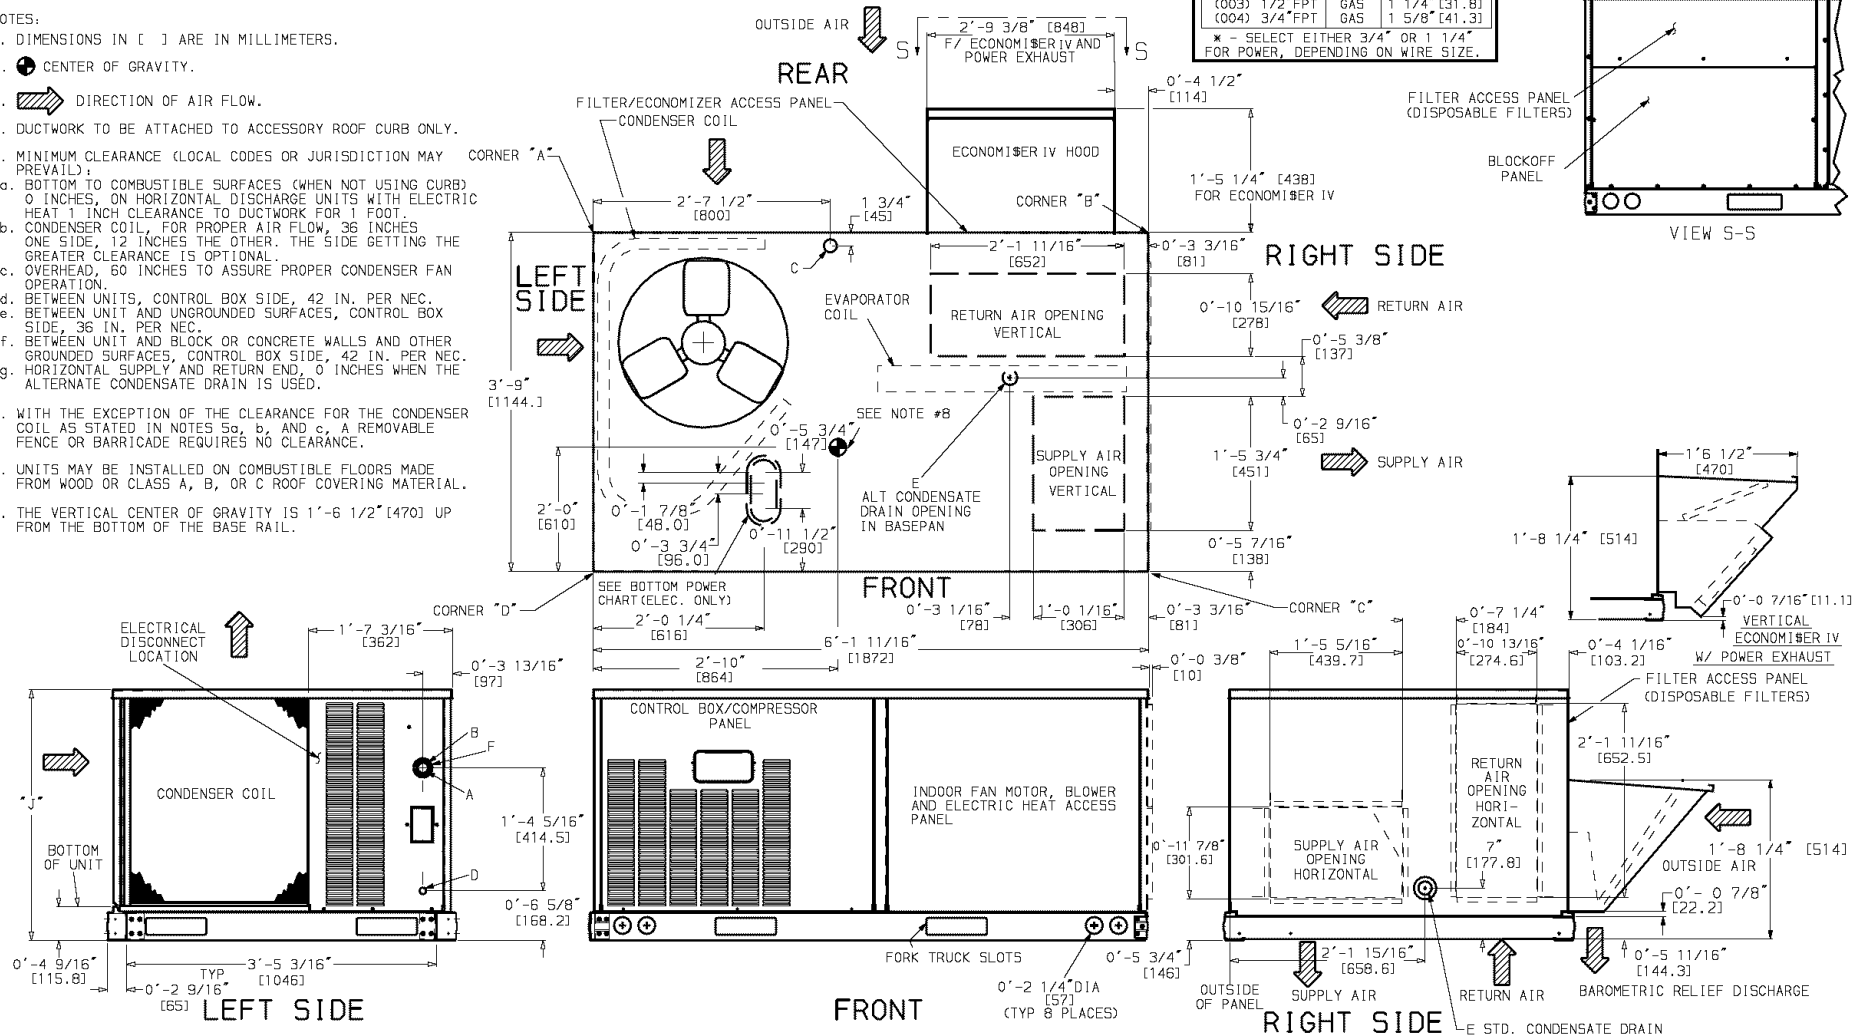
B — Base Unit Dimensions — 50TM007 Units
